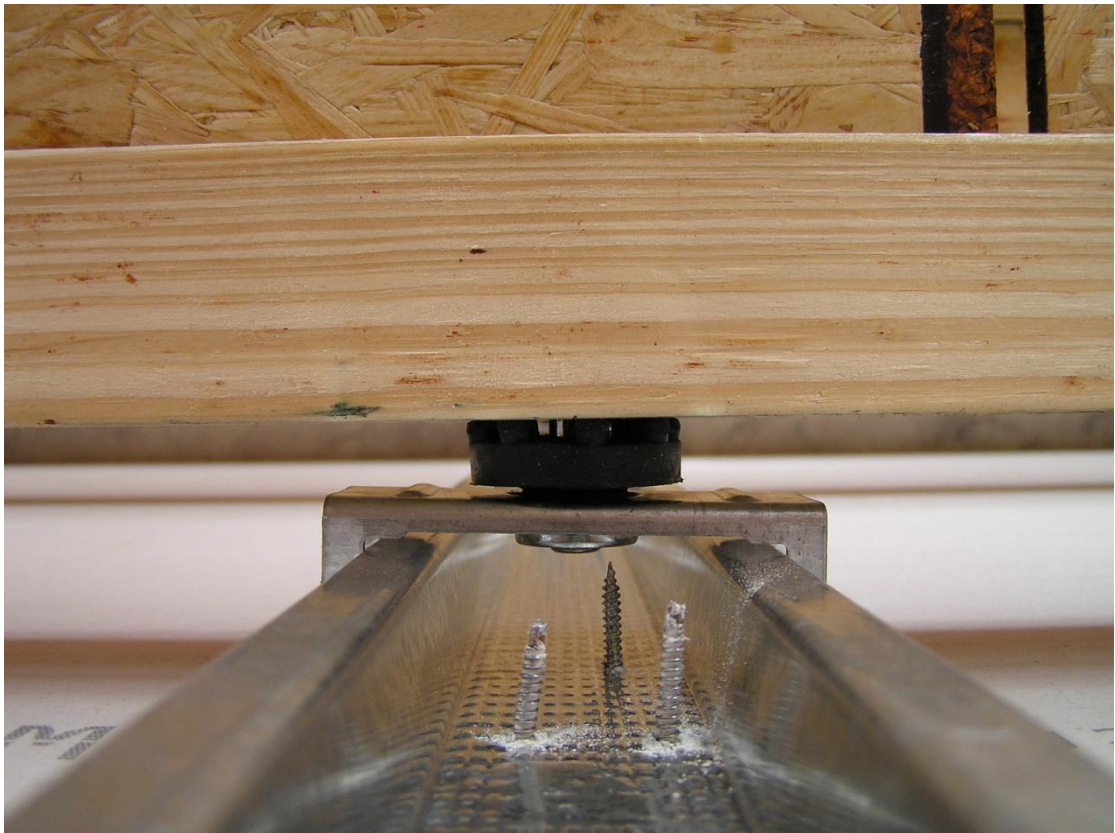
Photograph of the resilient mount and furring channel system used to support the ceiling under the timber floor joists taken during construction. The same system was used to support the linings of the chamber walls
